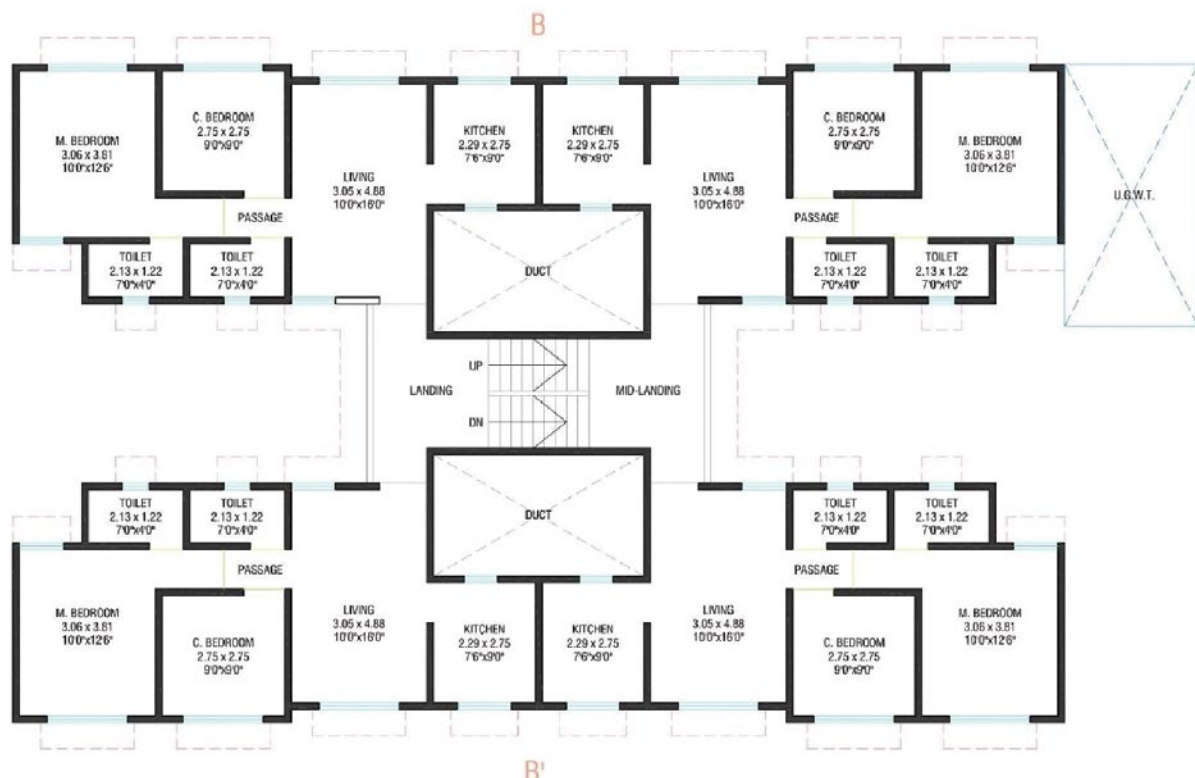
Another view of the architectural plan showing details of room sizes in a typical flat
